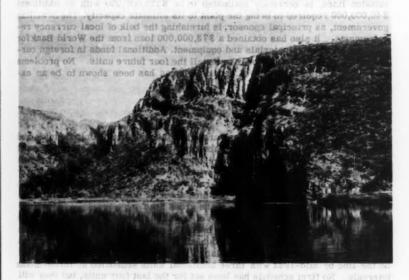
LEFT ABUTMENT, VICINITY OF DIVERSION TUNNEL INTAKE PORTALS
